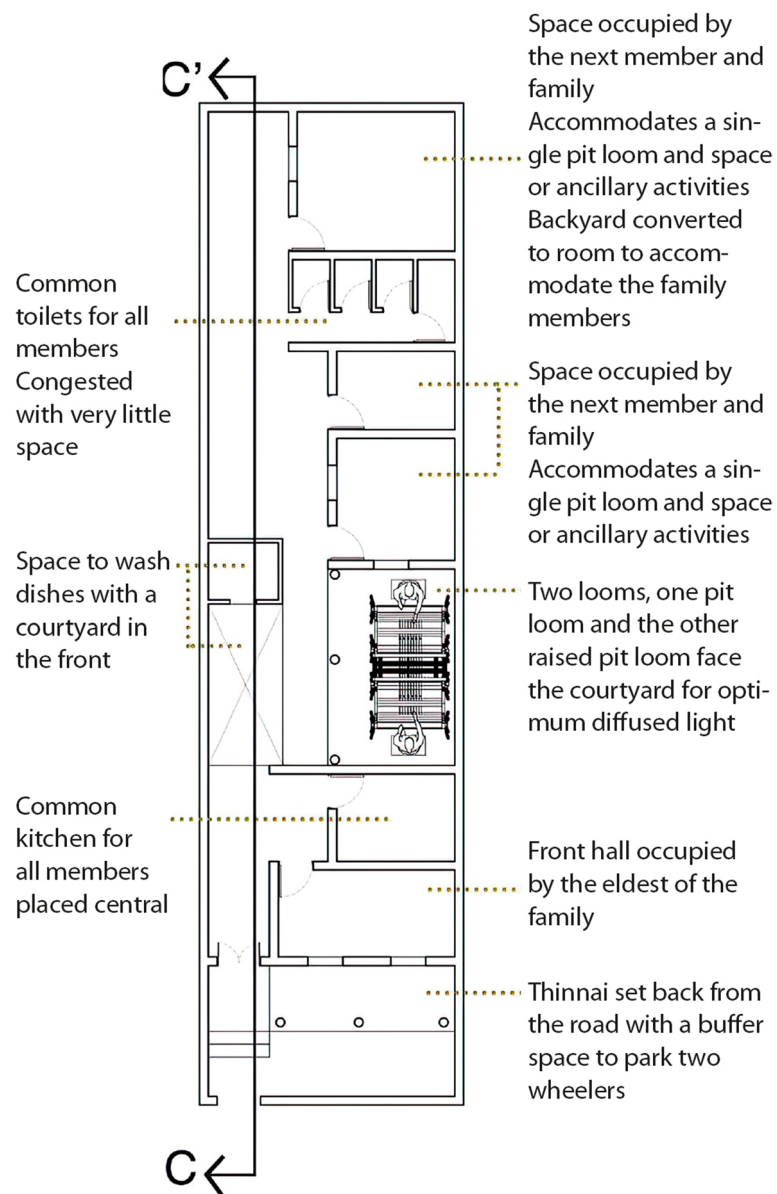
Floor plan of a joint family dwelling and its spatial characteristics (Source: the author)
